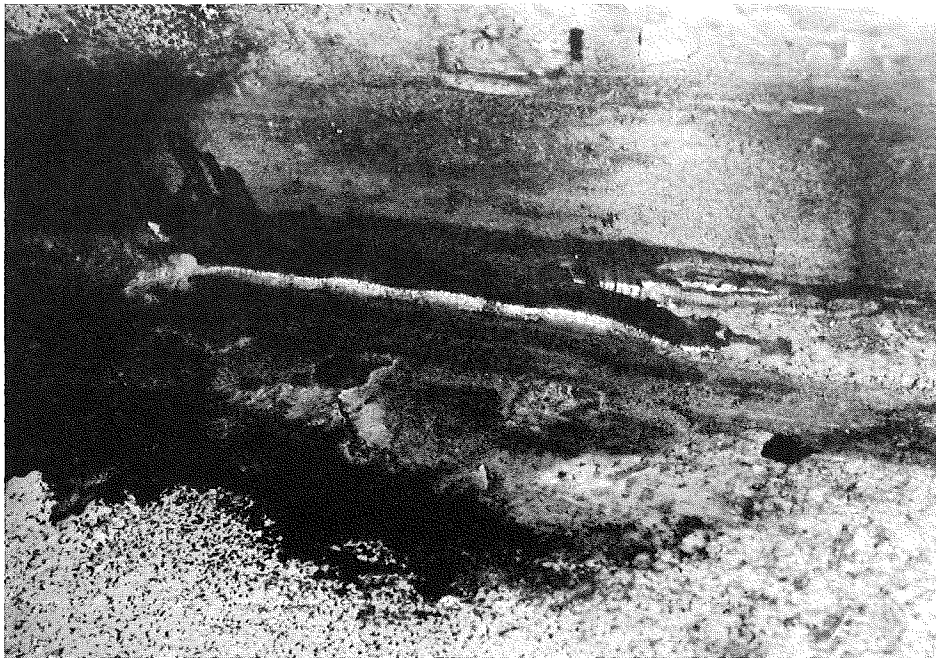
Weld Toe Regions on Web and at Flange After Grinding
